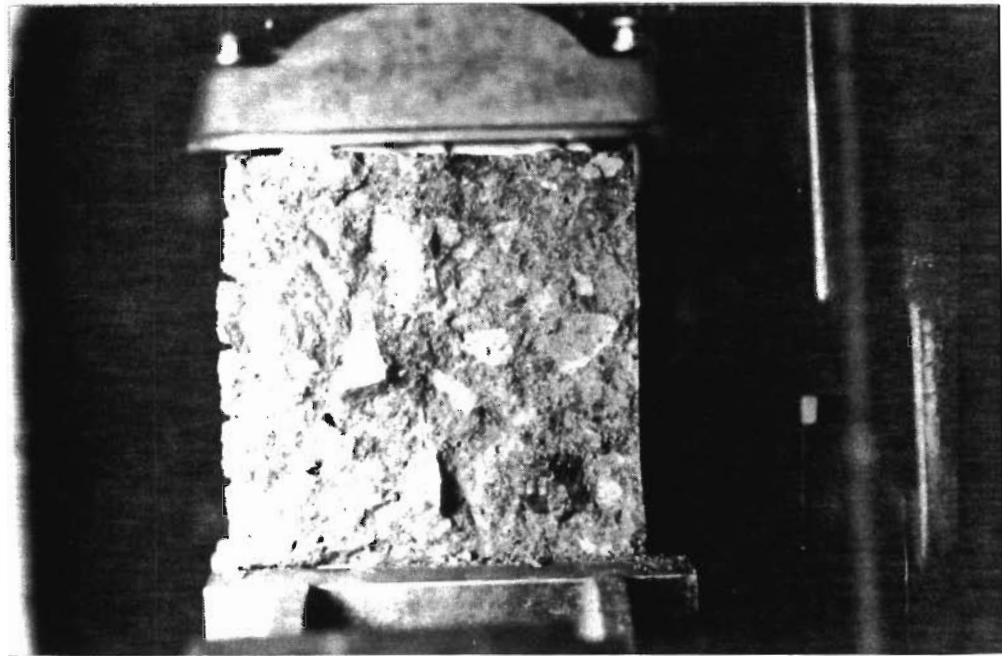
Typical fracture plane of a specimen tested as shown in the previous figure.
